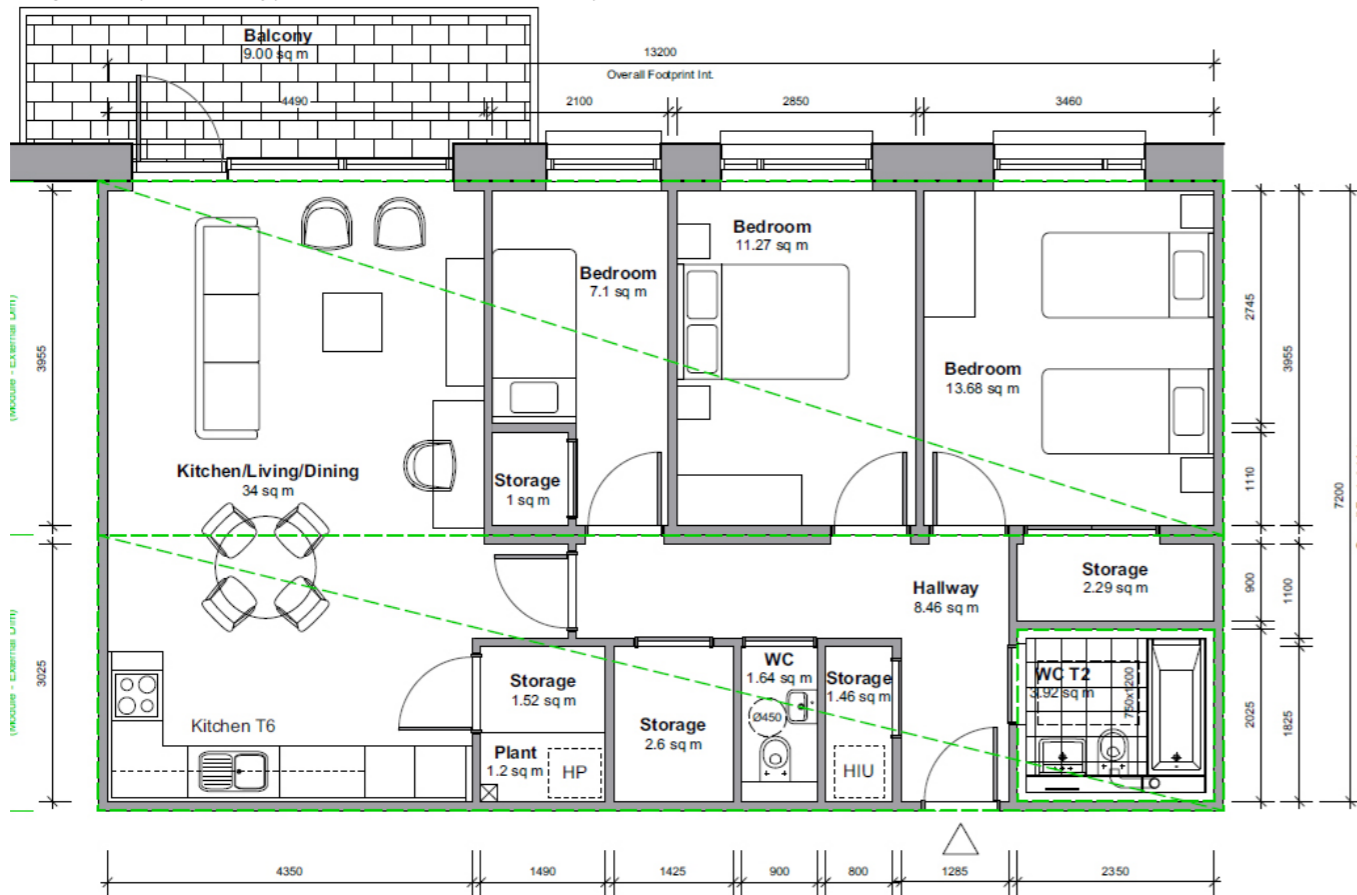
Apartment Type A-3B5P-1 Three Bedroom Apartment
